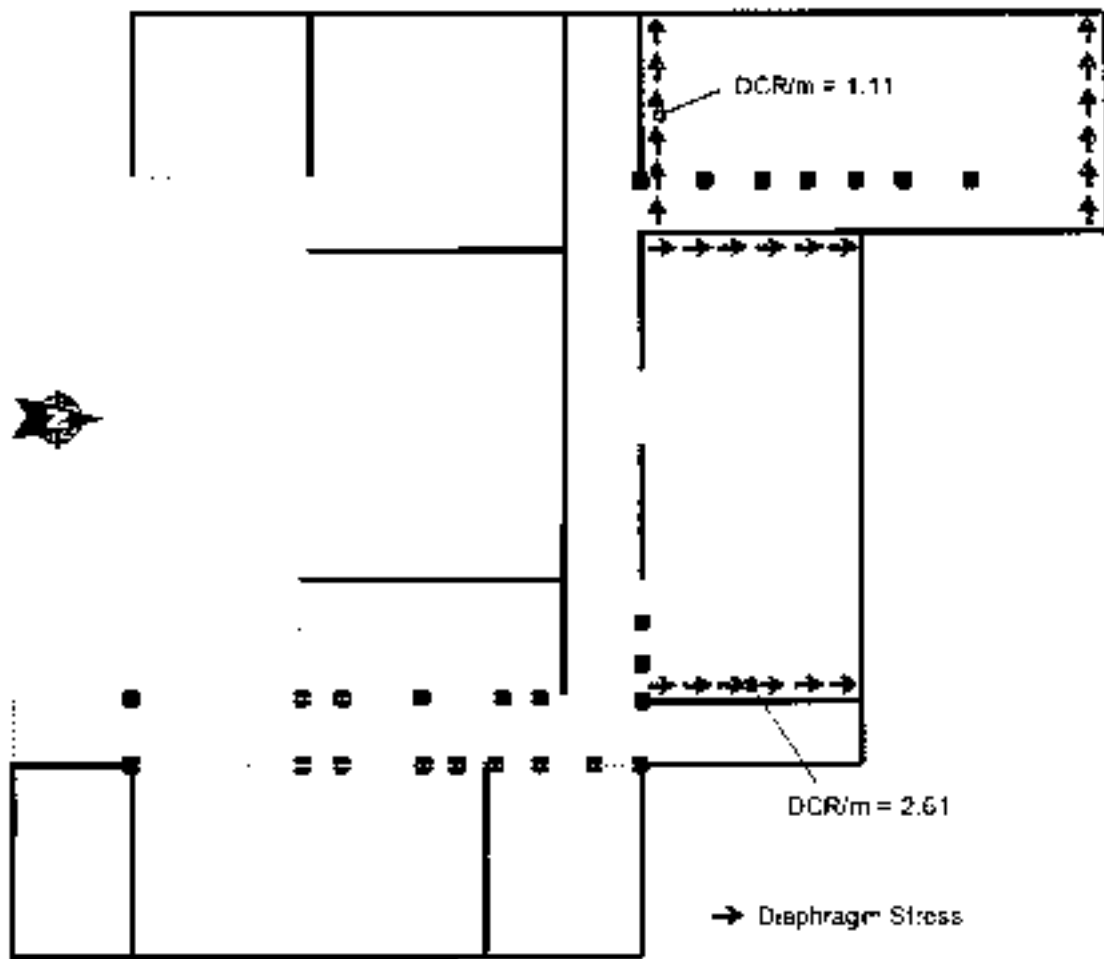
Building B (Art & Music), Structural Deficiencies at 2nd Floor Diaphragm
